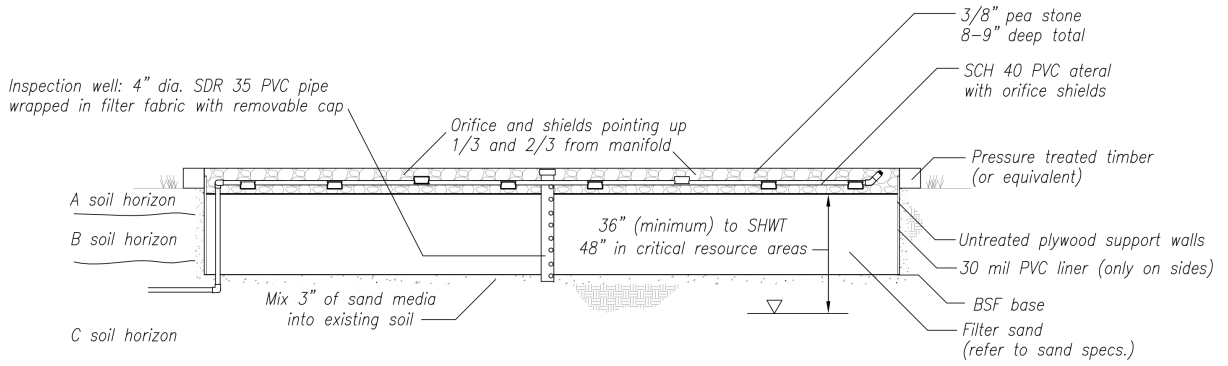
IN-GROUND BOTTOMLESS SAND FILTER (SIDE VIEW)
